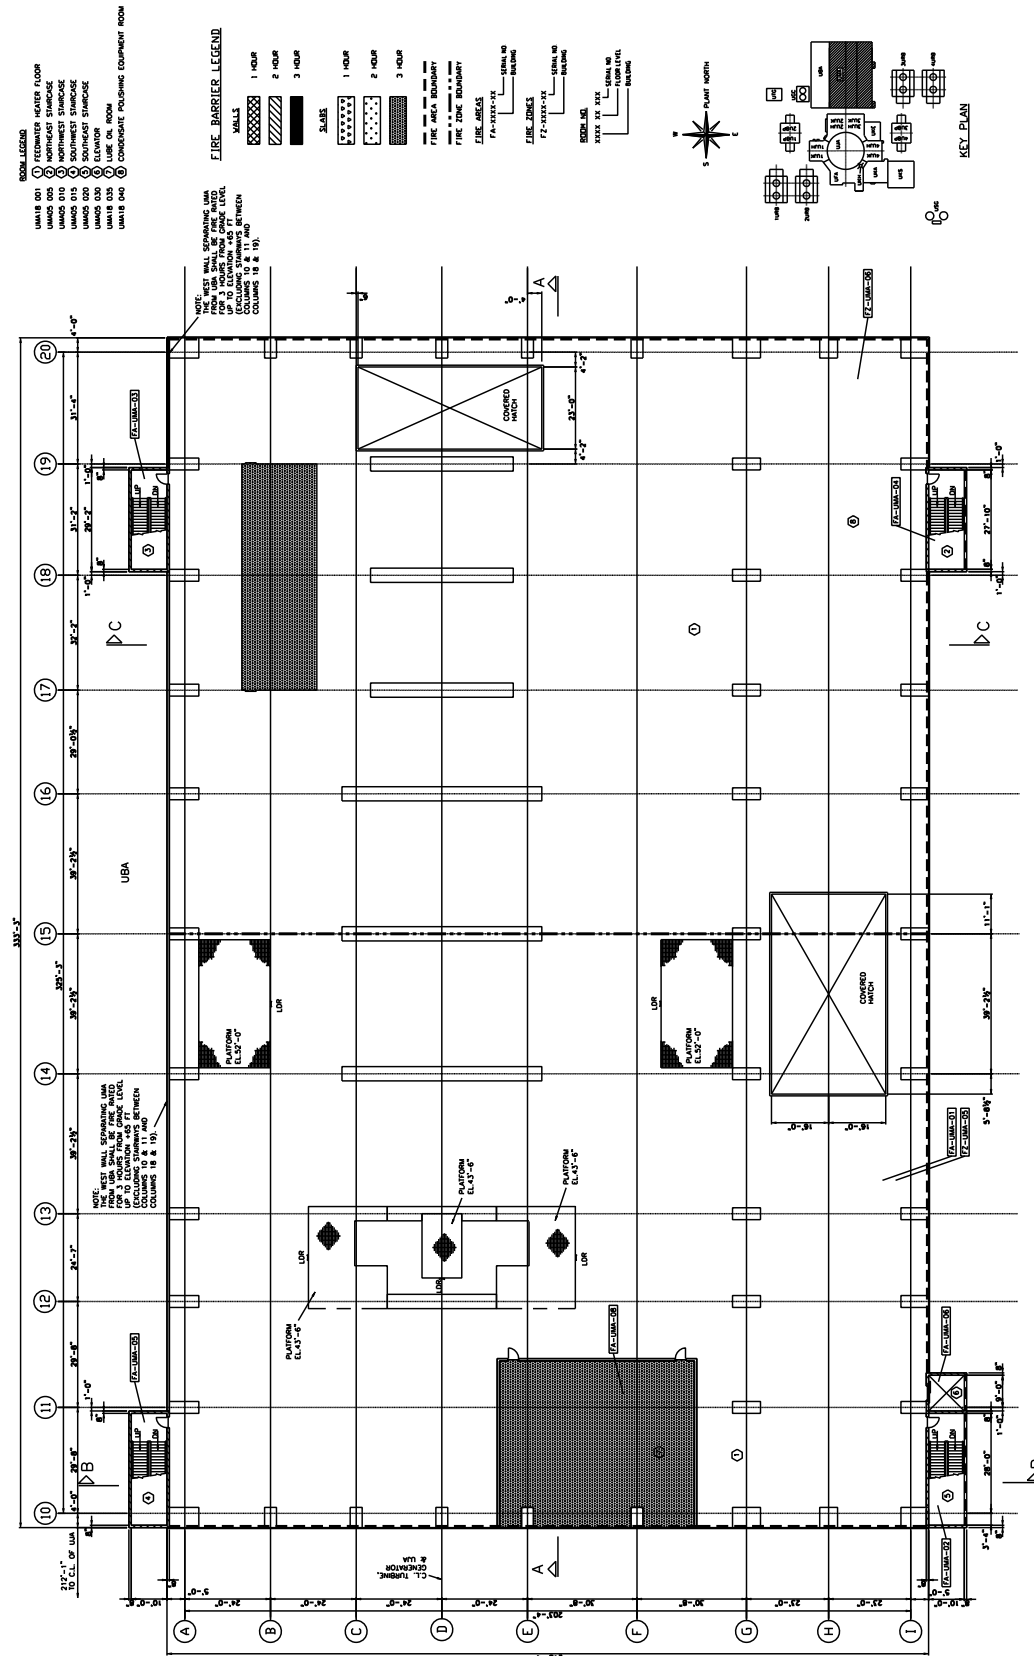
B-4—{Fire Barrier Location, Turbine Building Plan at Elevation +65 ft}
